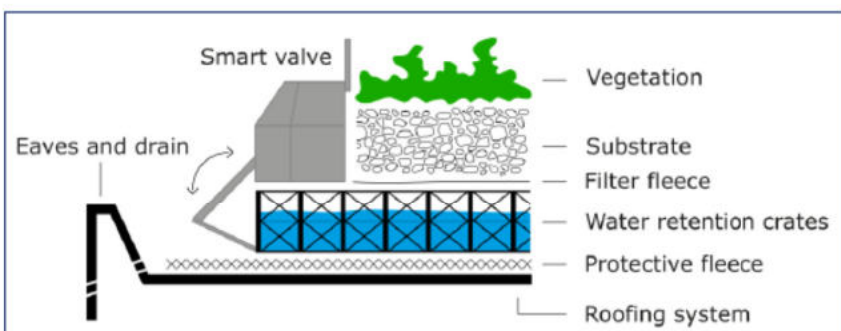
Schematic cross section of a Polderroof with vegetation/green roof
